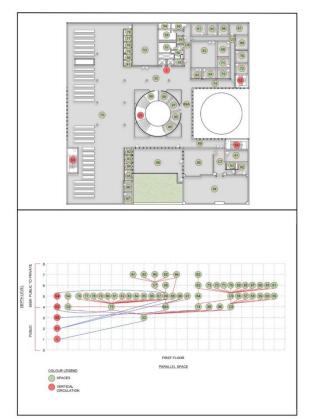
Redrawn First Floor Plan and Justified Graph of First Floor Floor for SCCC Learning Resource Center
